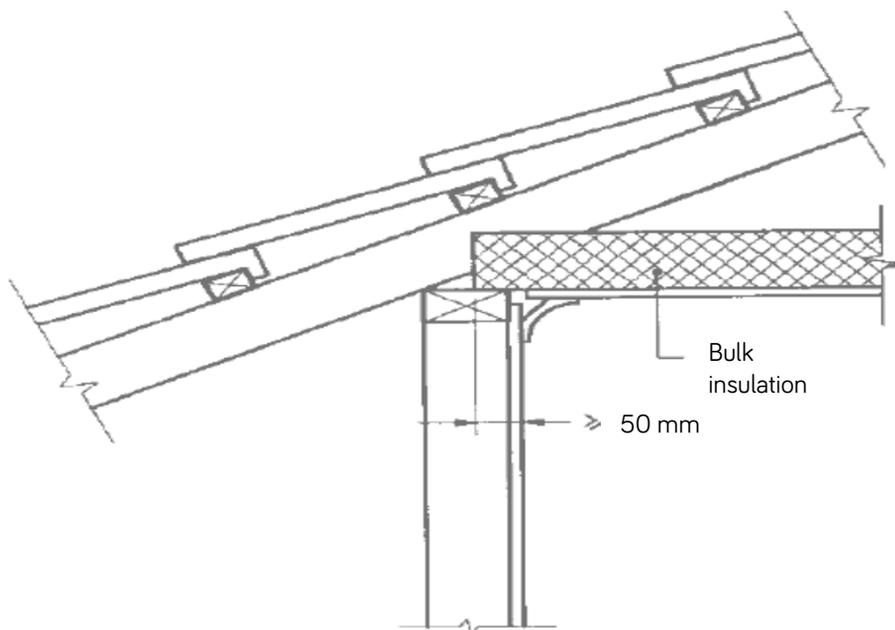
Insulation of horizontal ceiling with pitched tiled roofs.
